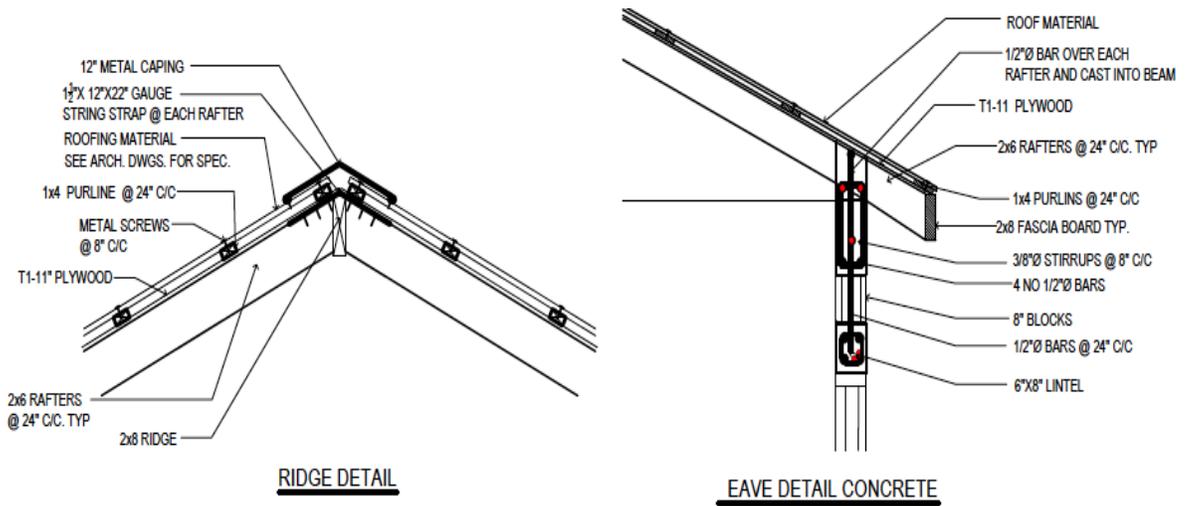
Illustrates the individual roof details of a typical Gable roof.
